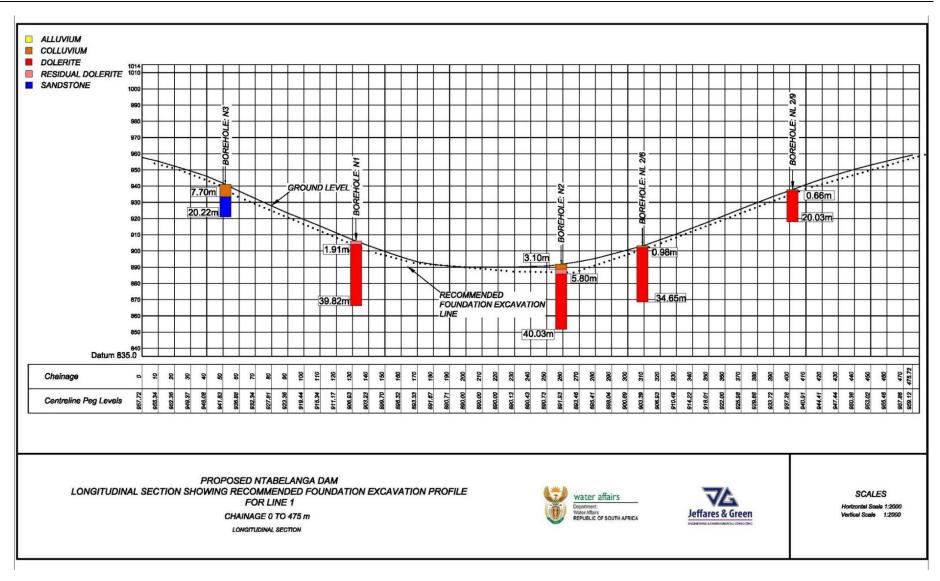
Line 1 - Core Log Summary and Recommended Foundation Profile
